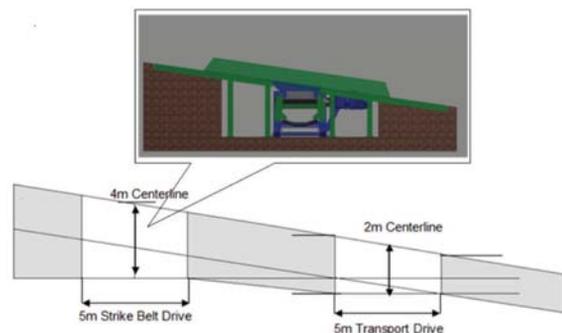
Footwall tip, strike belt drive, and transport drive (section view)
